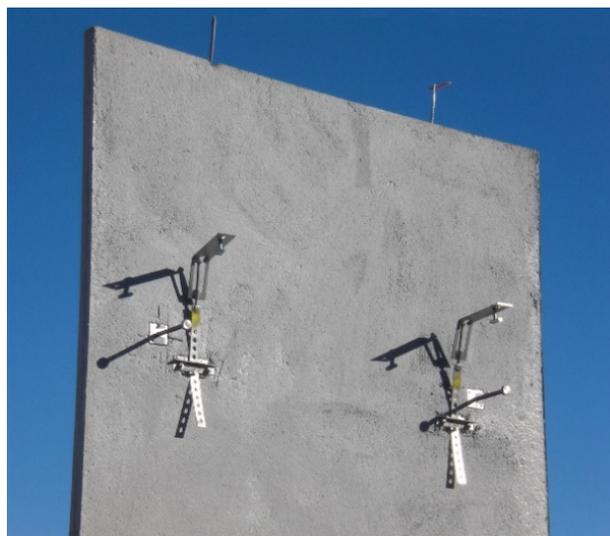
Storey-high façade element with new fixing system for carbon reinforced concrete.
